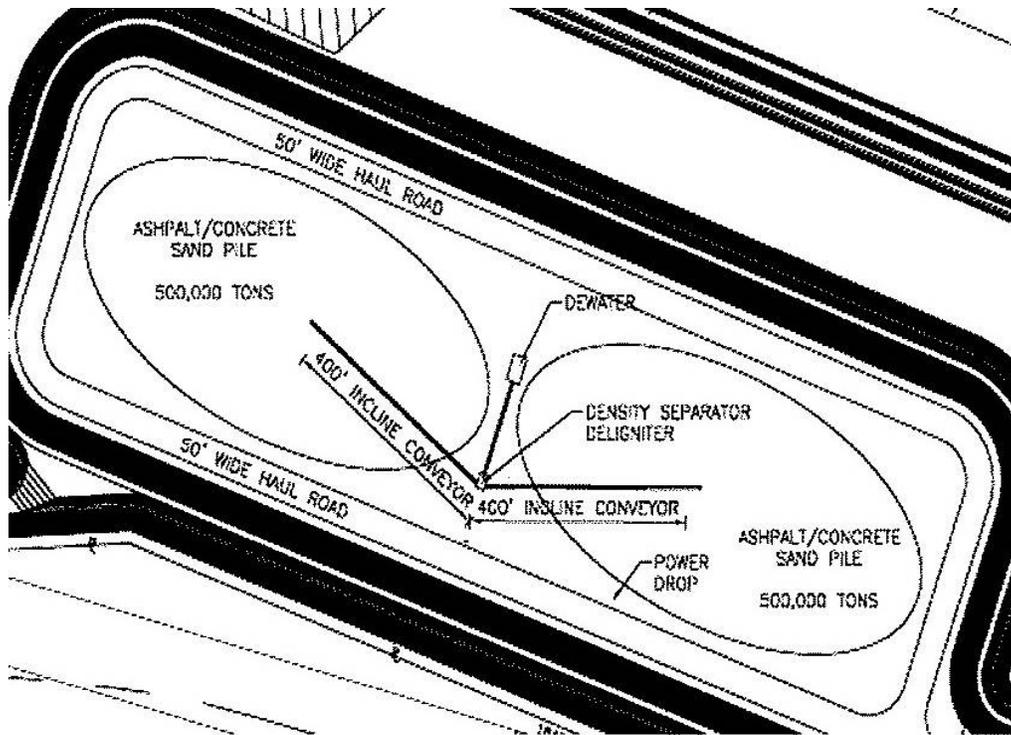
Master's Waldron Sand Plant – General Site Plan
